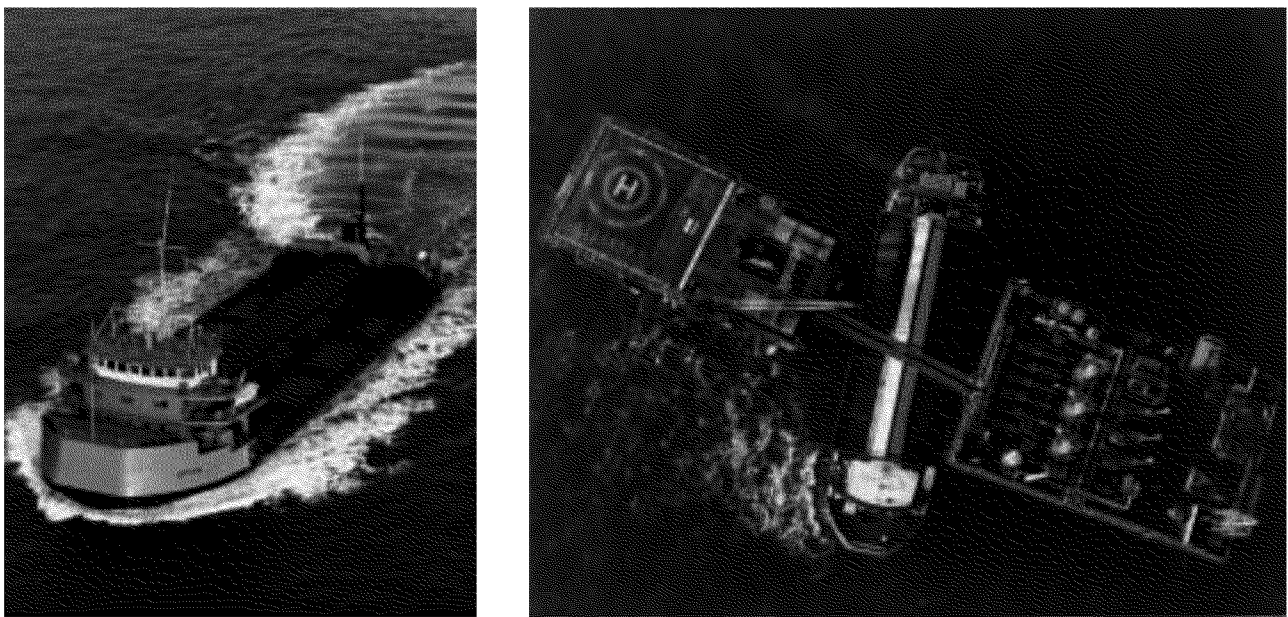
A side dump vessel underway (left) and placing scour protection between two steel installations (right).
